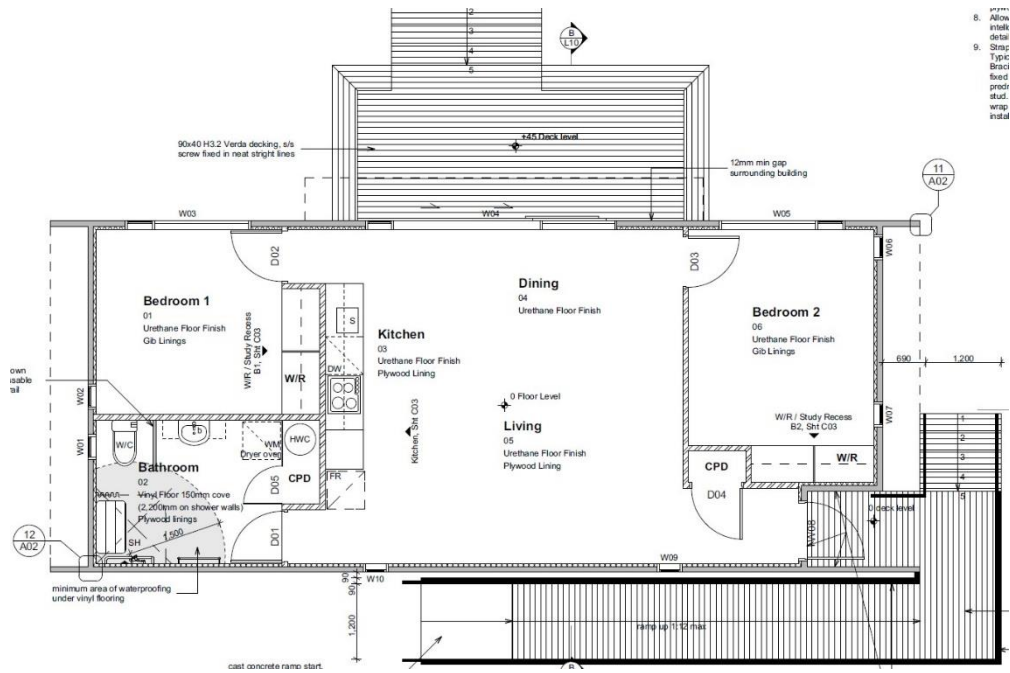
M-type Rotorua Thermal Holiday Park Bedroom Cabin, Plan Layout, designed by Darryl Church Architecture
